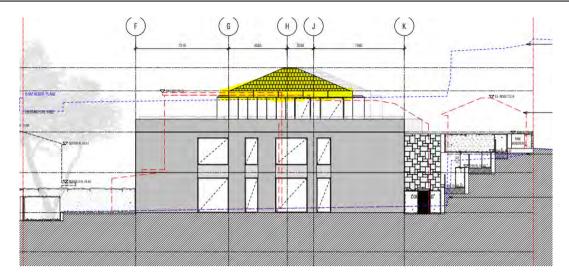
Eastern elevation of building E1/E2 - Plan DA13, showing blue dashed 8.5m height line and section of eastern building over the height limit, shaded yellow.(Mathieson Arch).
